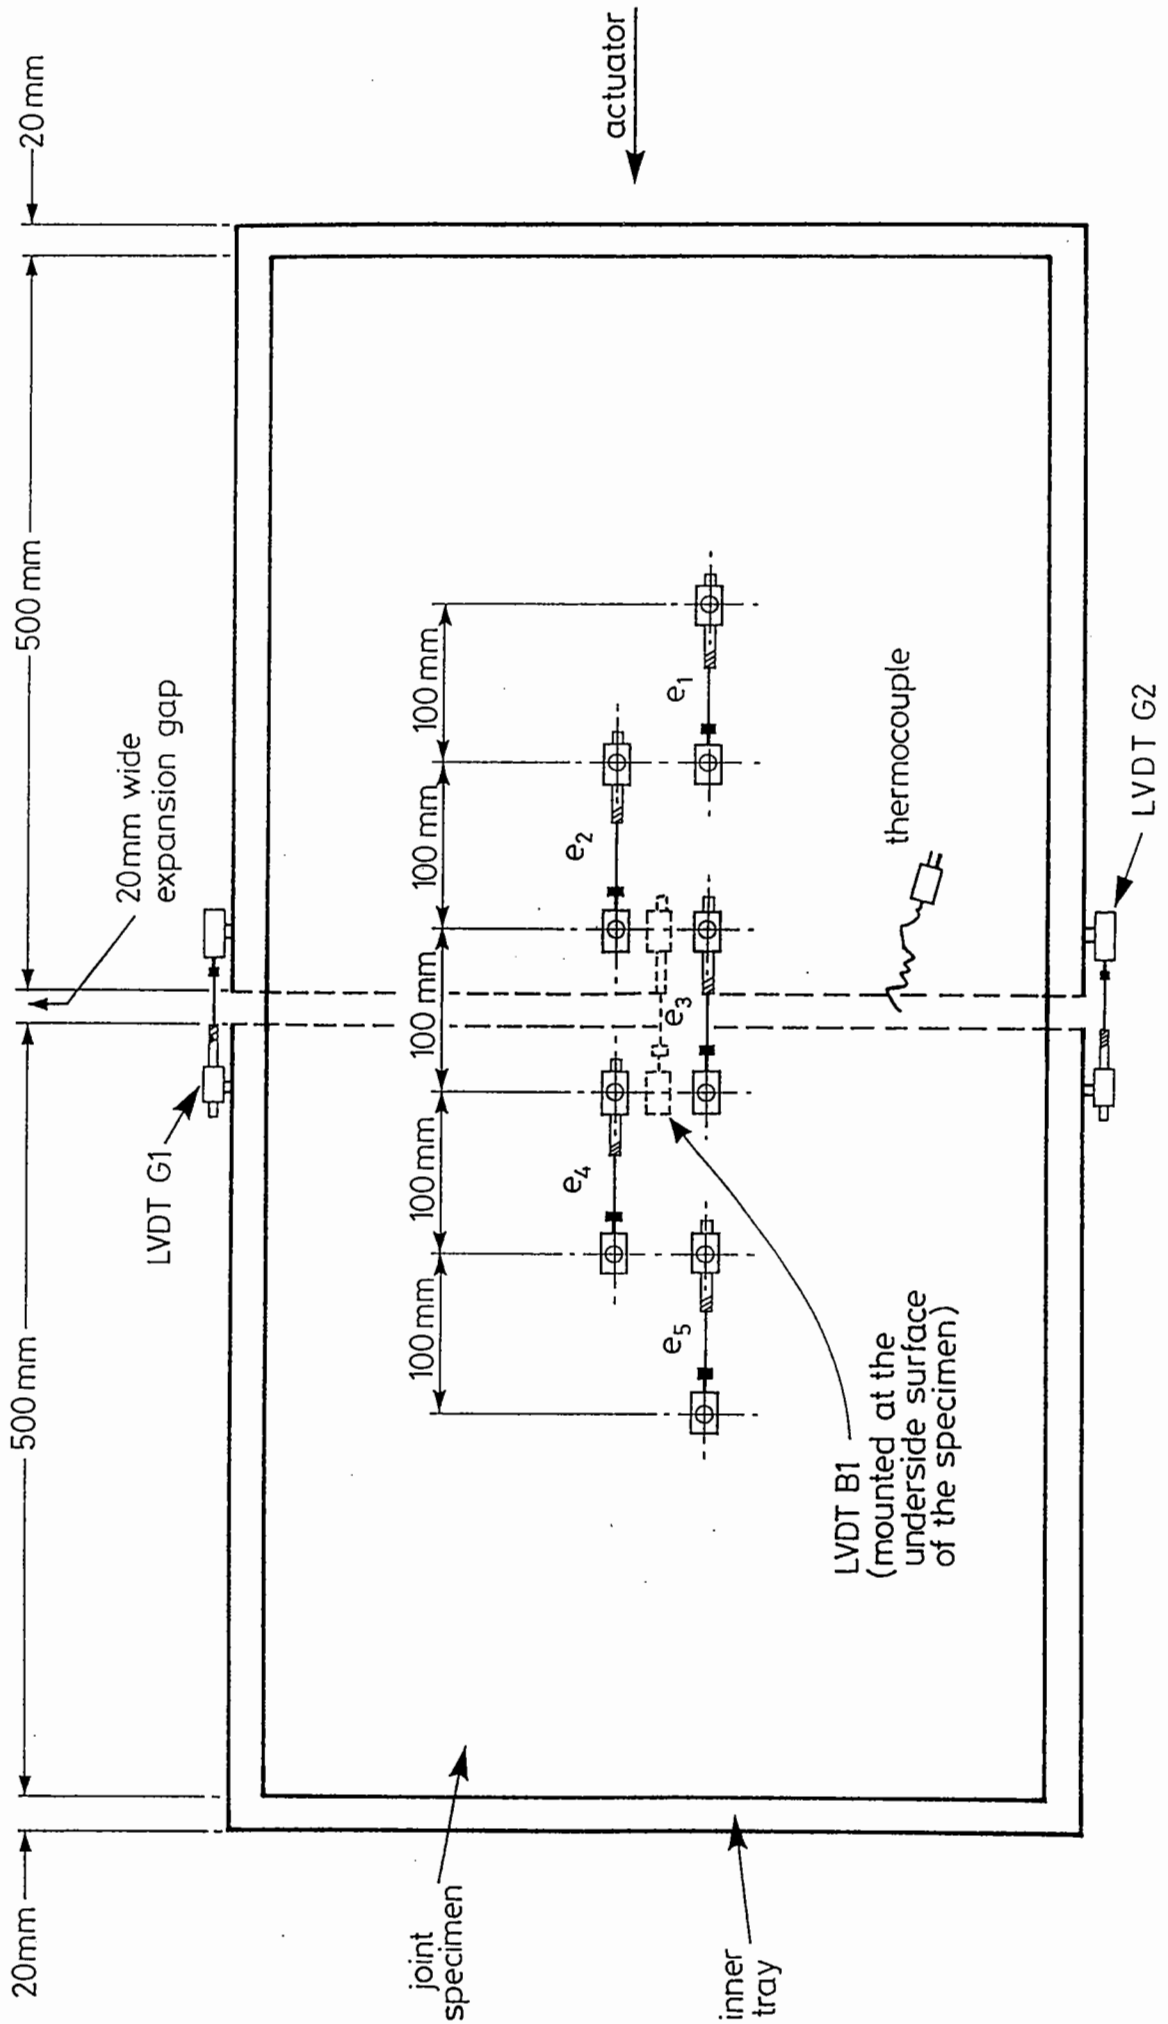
PLAN : INSTRUMENTATION OF THE SPECIMEN
